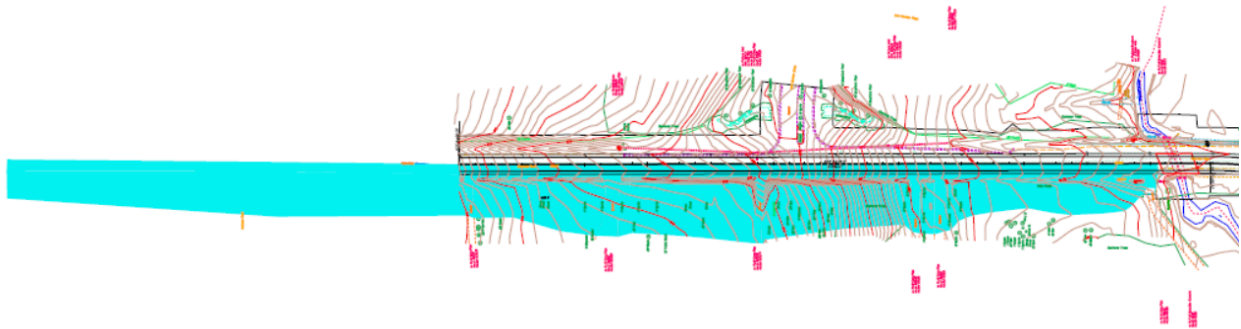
Plan View of Drainage Area for Proposed Bioretention Garden
